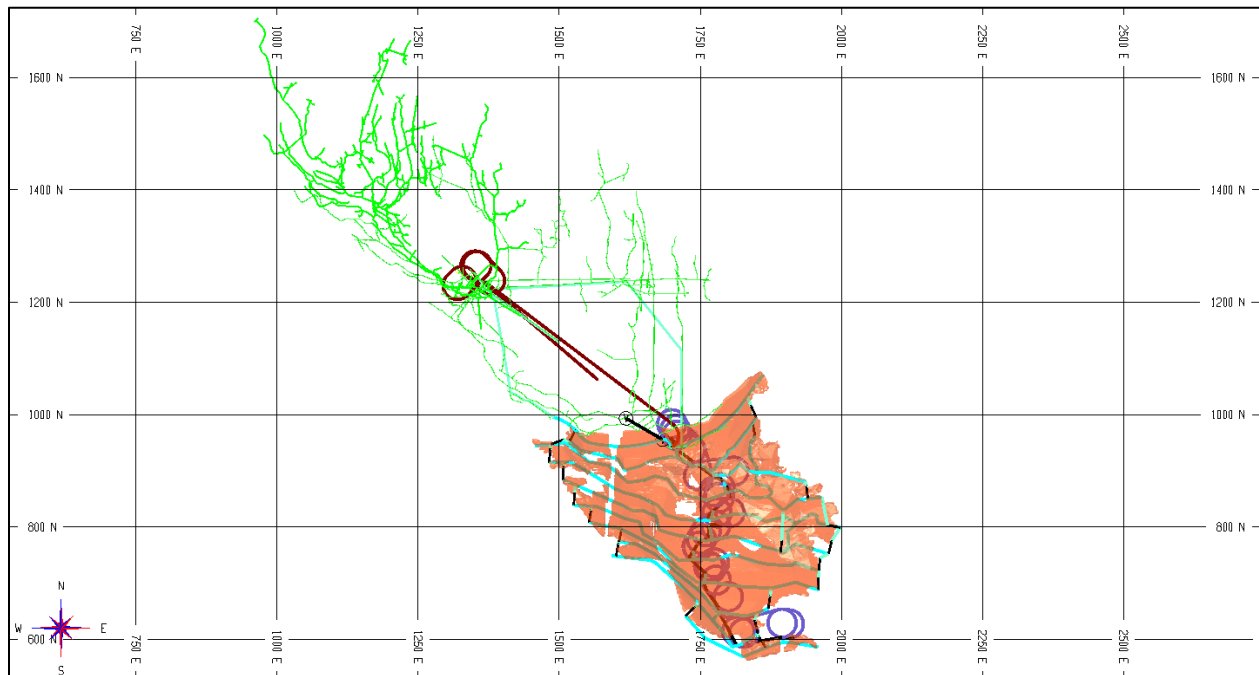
New Polaris Mine Plan Development and Orebody, plan view in mine specific space
